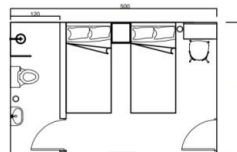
Layout sketch of Twin Room (Azkia, 2023)
